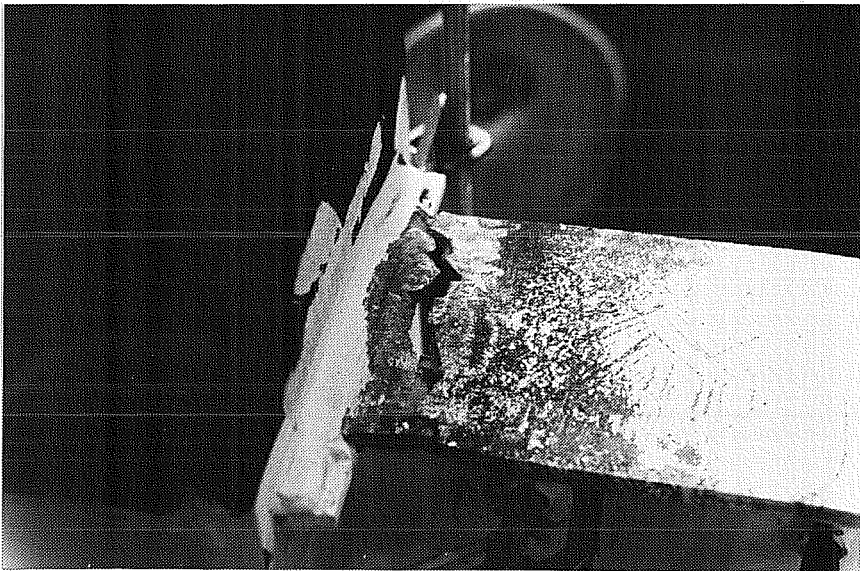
Top Flange Failure in Specimen 1
